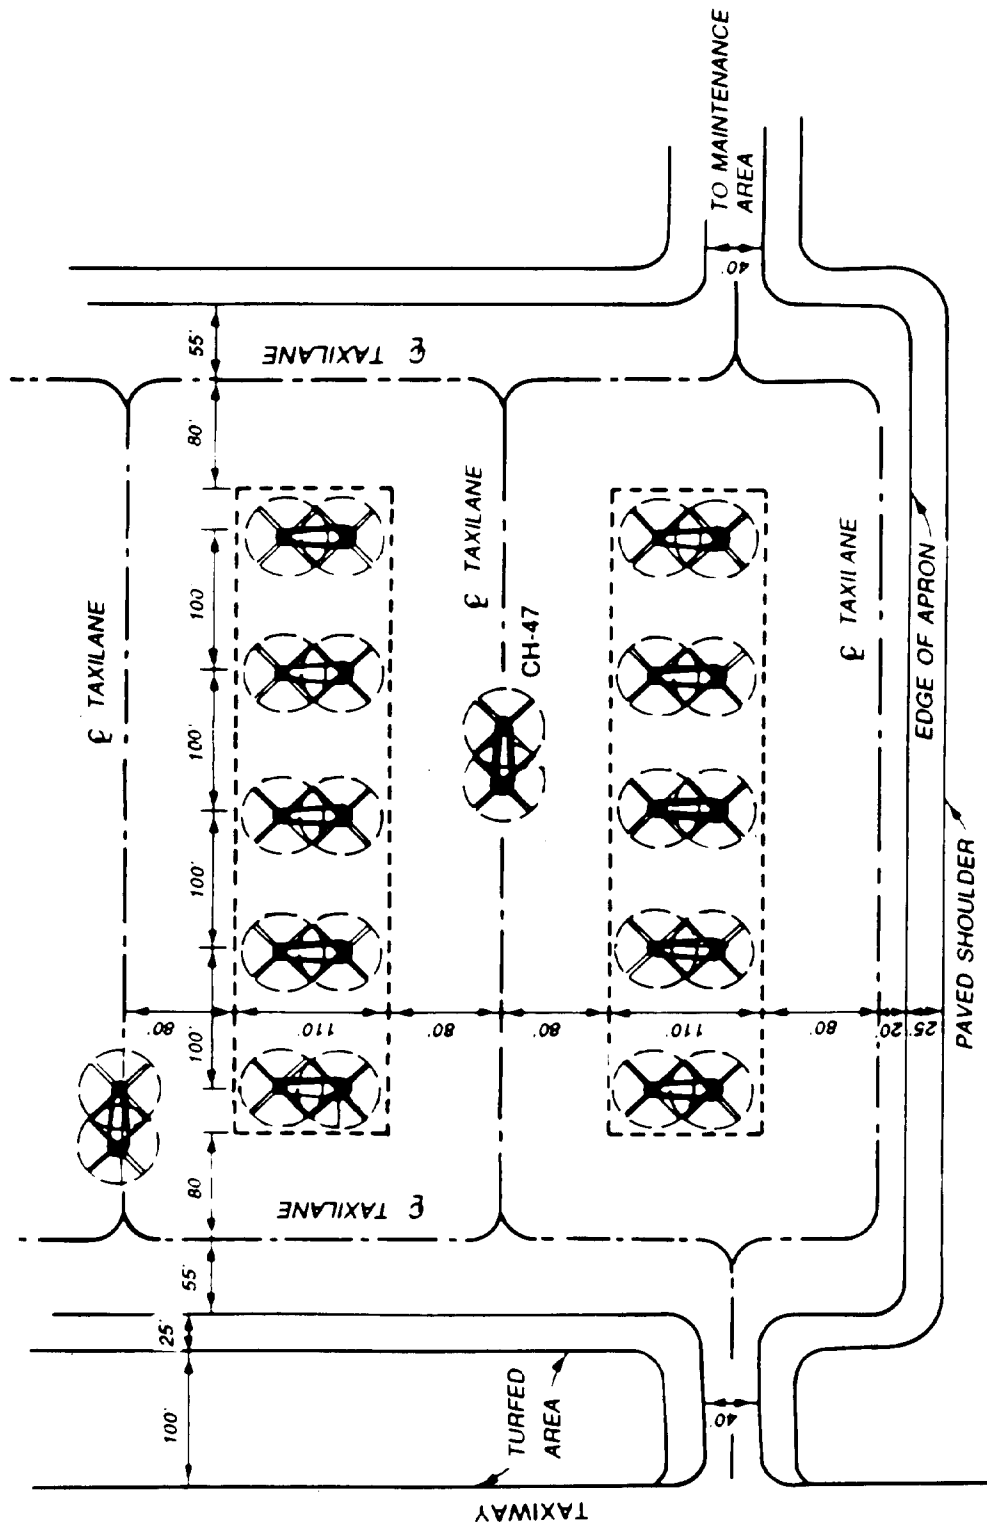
CH-47 Parking Plan, Type 1 (Single Lane)
